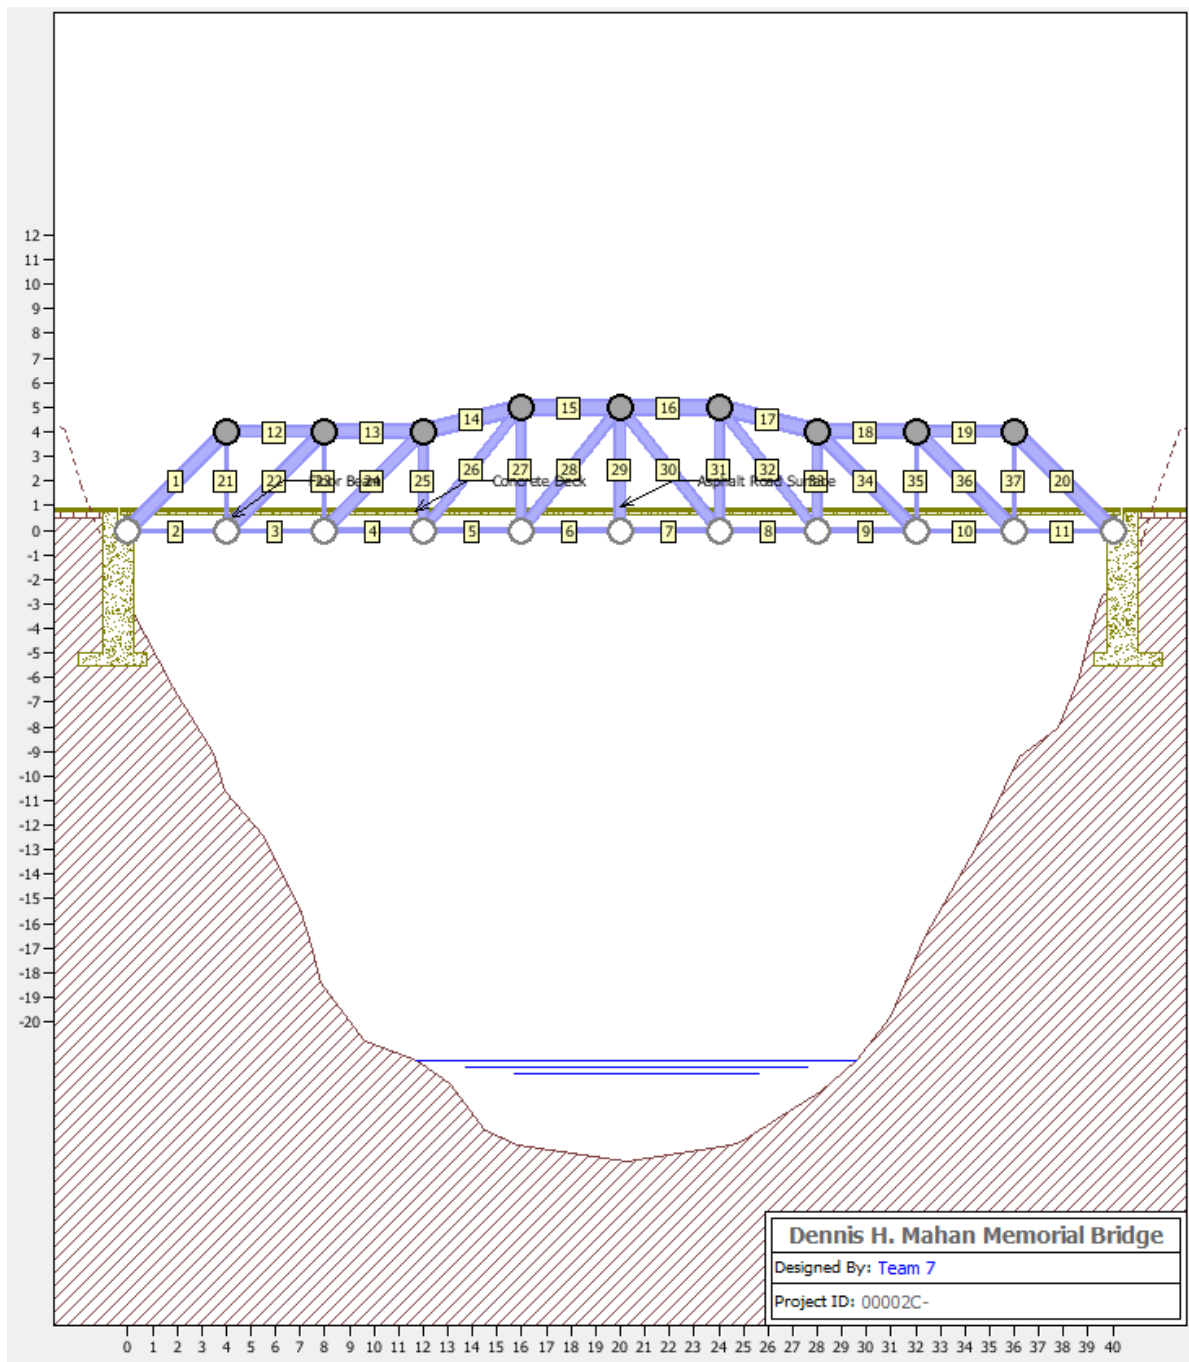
Howe Truss Bridge Model from Bridge Designer 2016
